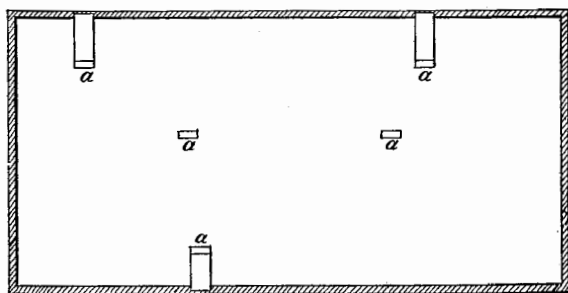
Attic Plan, Showing Ventilating Pipes in Natural System
